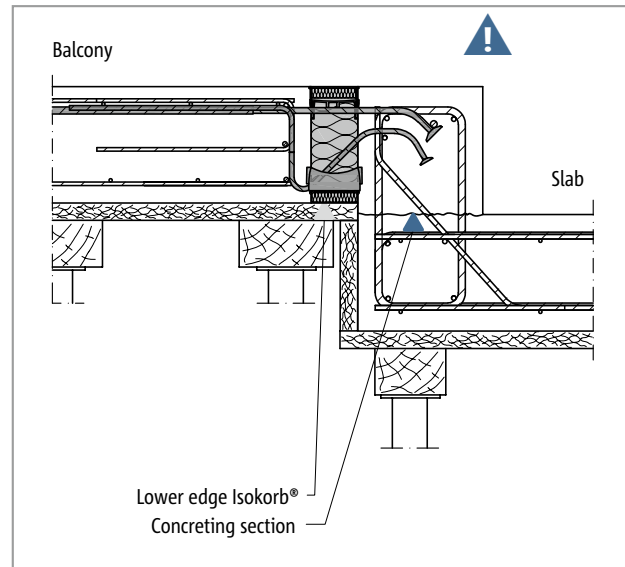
Schöck Isokorb® T type K-O: Cast-in-place concrete balcony with height offset upwards
